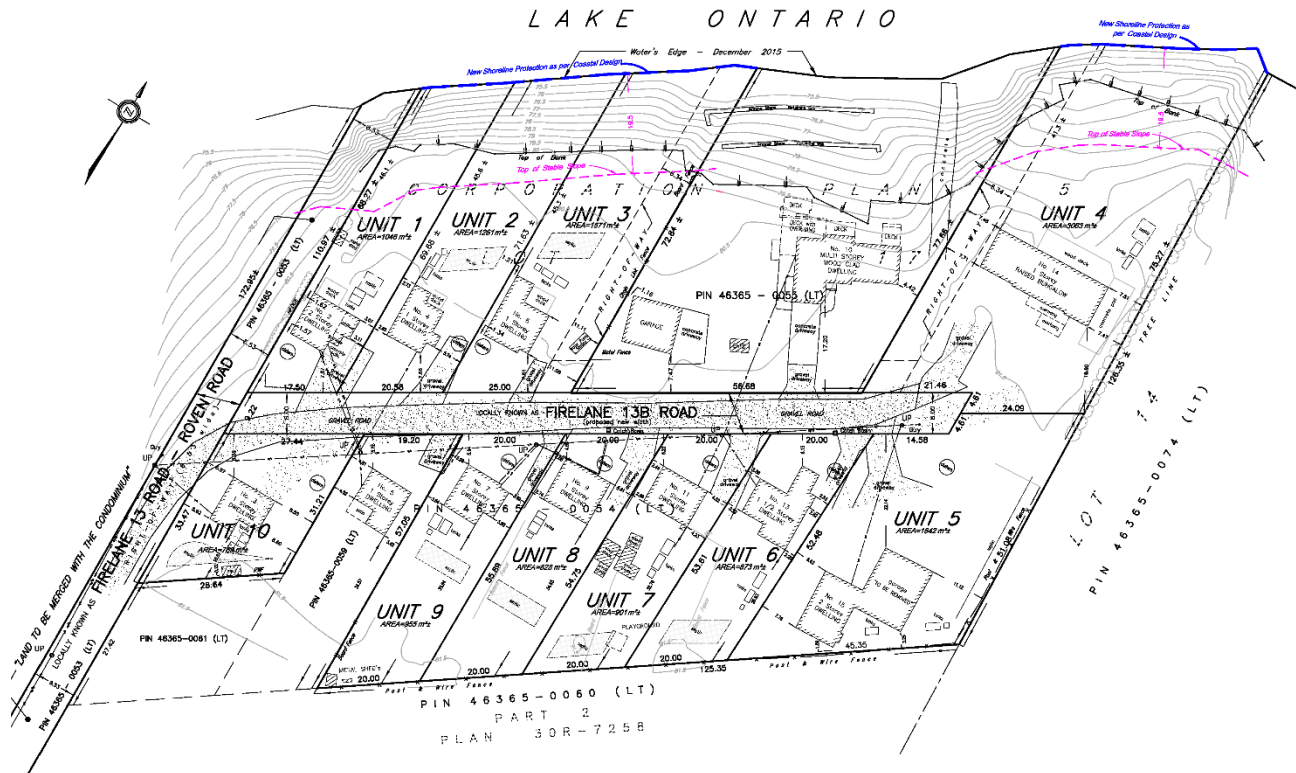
Site Plan prepared by JD Barnes identifying existing dwellings on the Subject Lands and proposed septic system locations.
